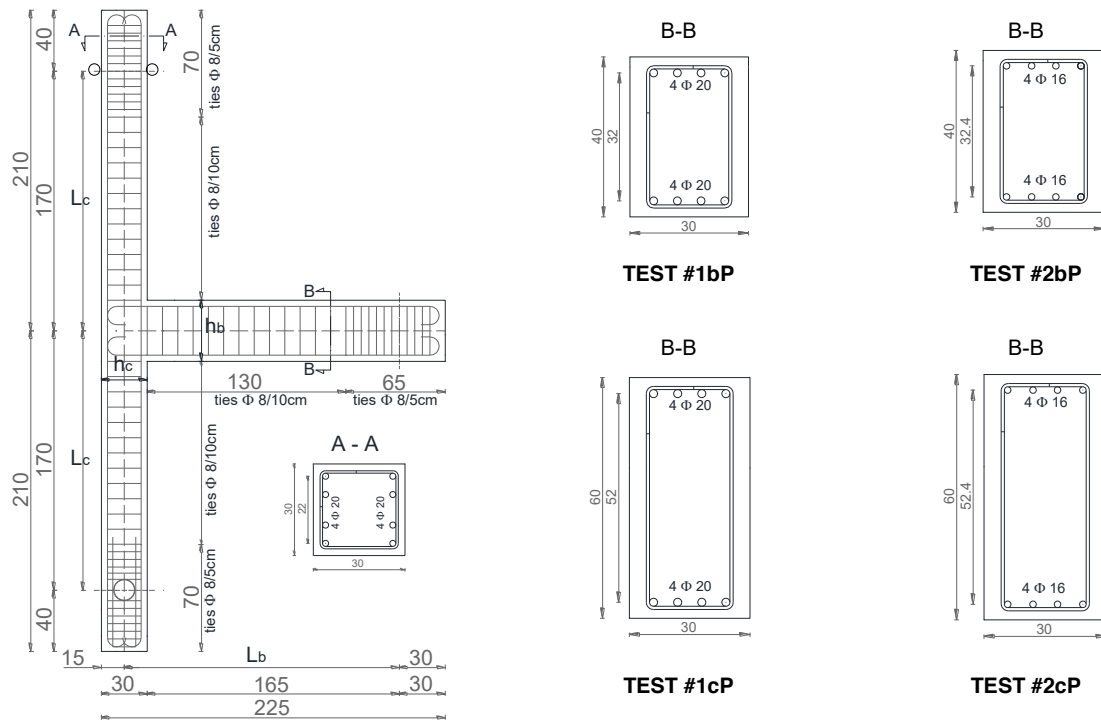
Geometry (dimensions in cm) and reinforcement details.
